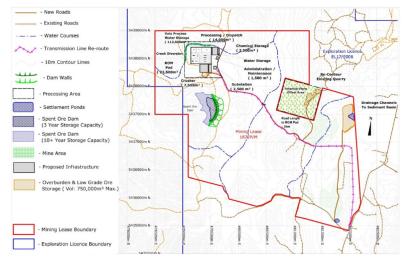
Site Plan for the Proposed Barnes Hill Mine
